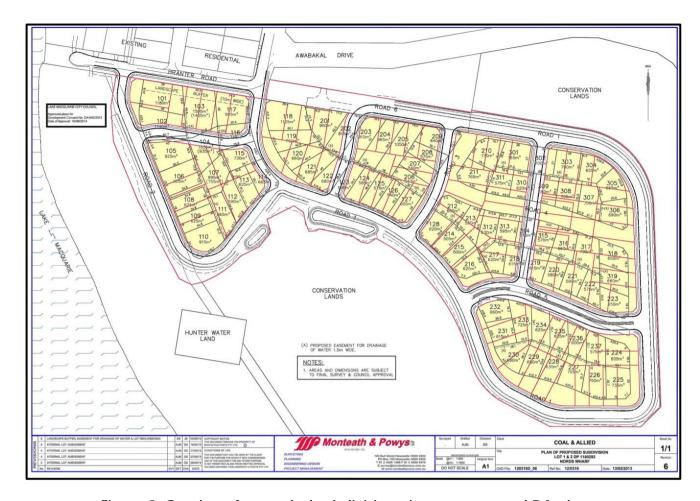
Overlay of amended subdivision plan on approved DA plan.
